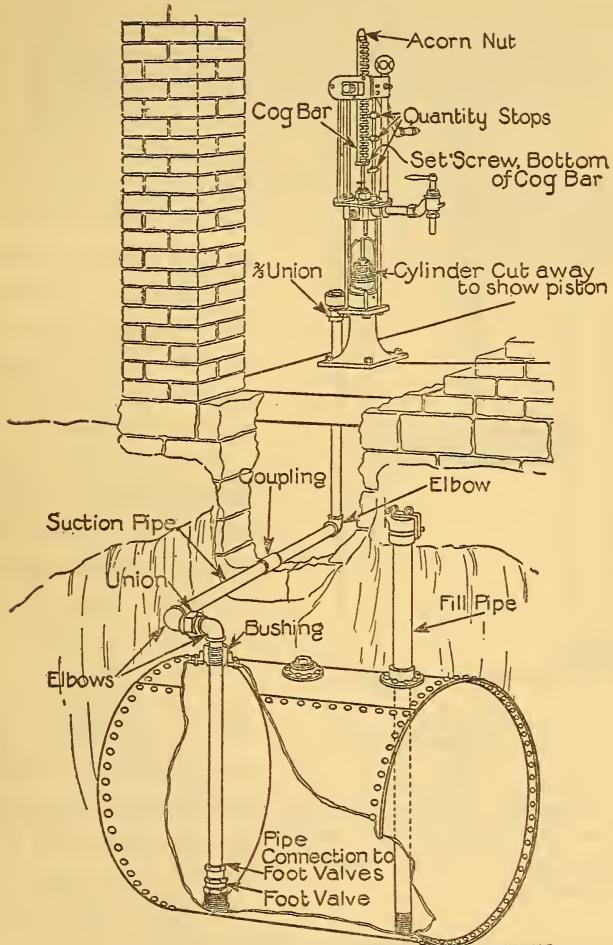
Typical piston-type measuring pump installation, showing arrangement of tank, piping, valves, etc.
